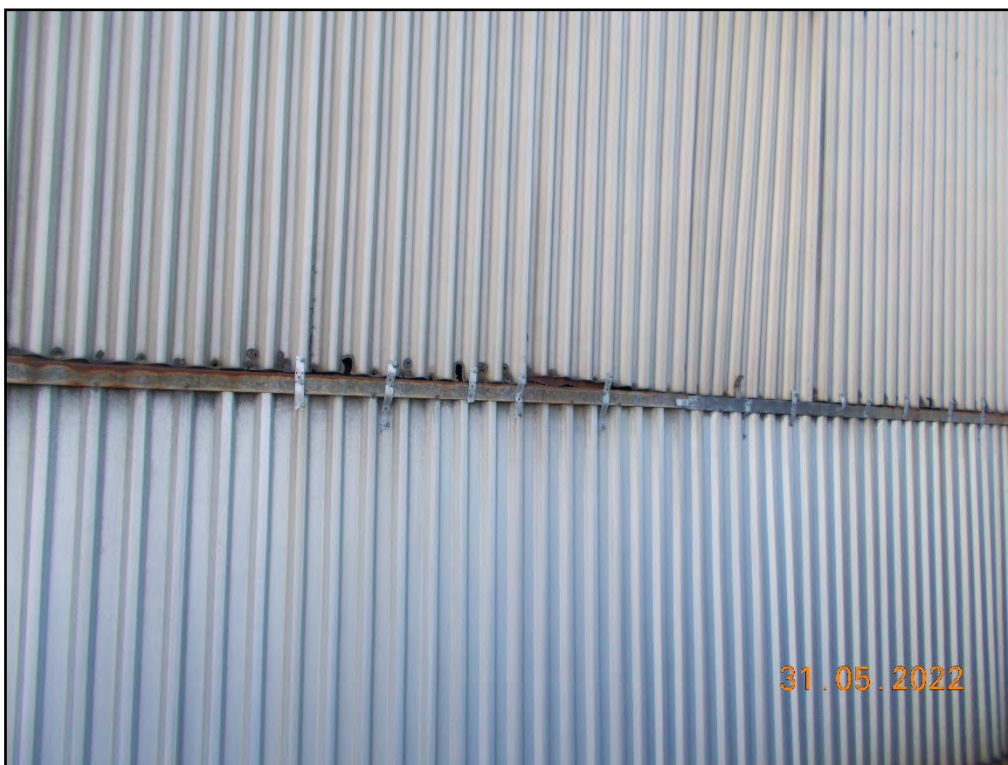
Surface Corrosion of Steel Member and Wall Sheeting
